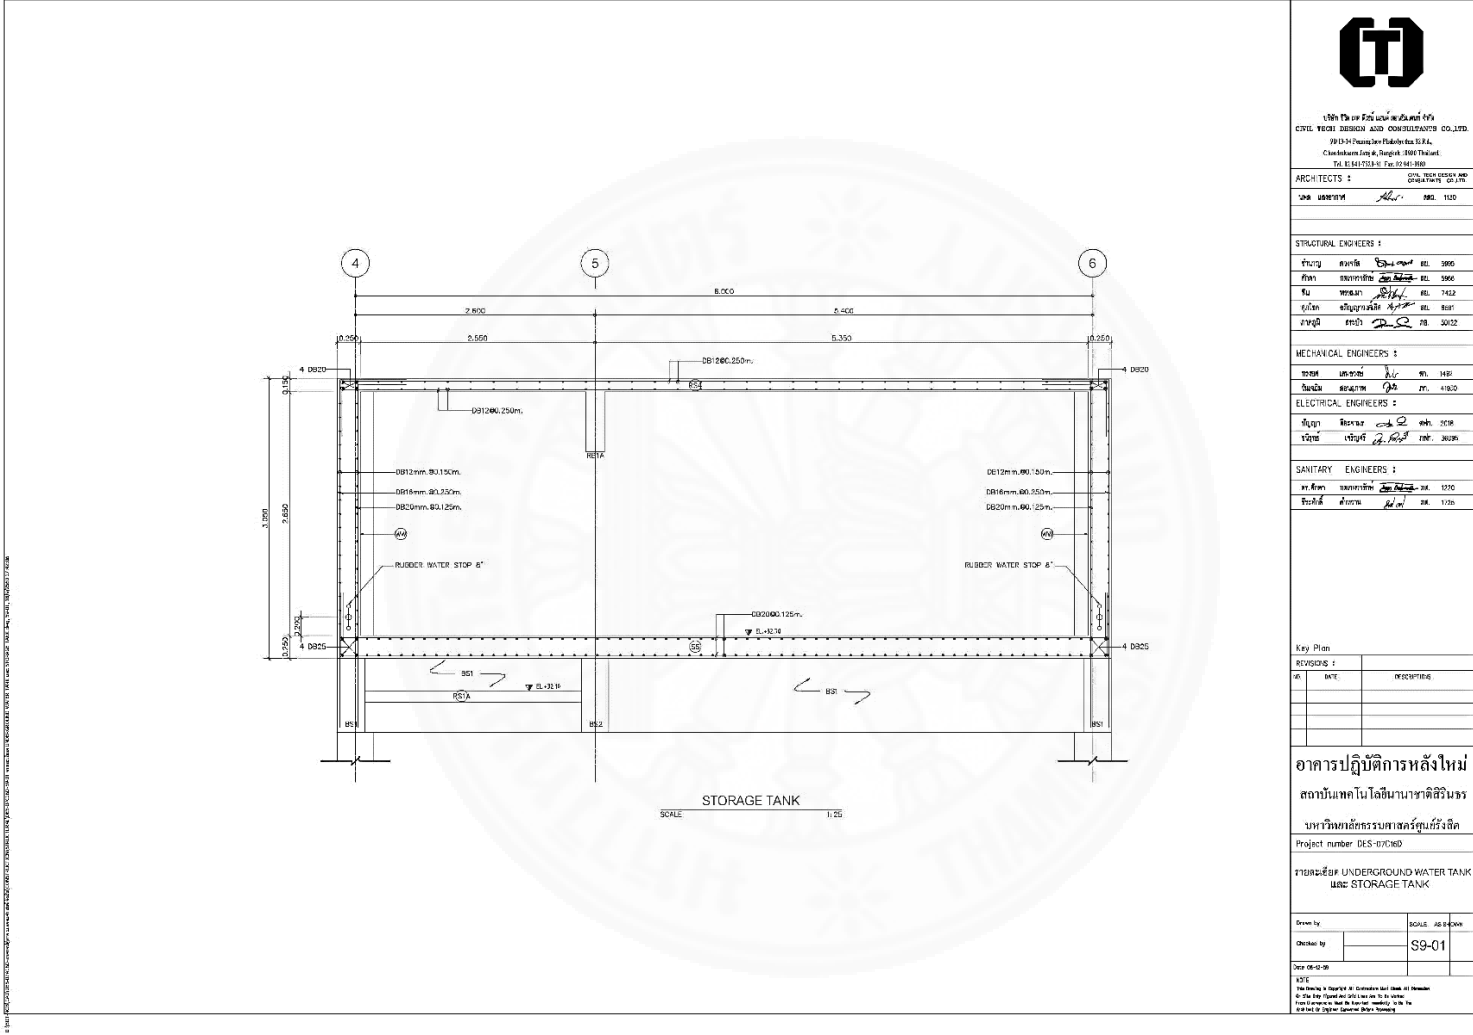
Typical section of water tank walls for both section A-A and section B-B
